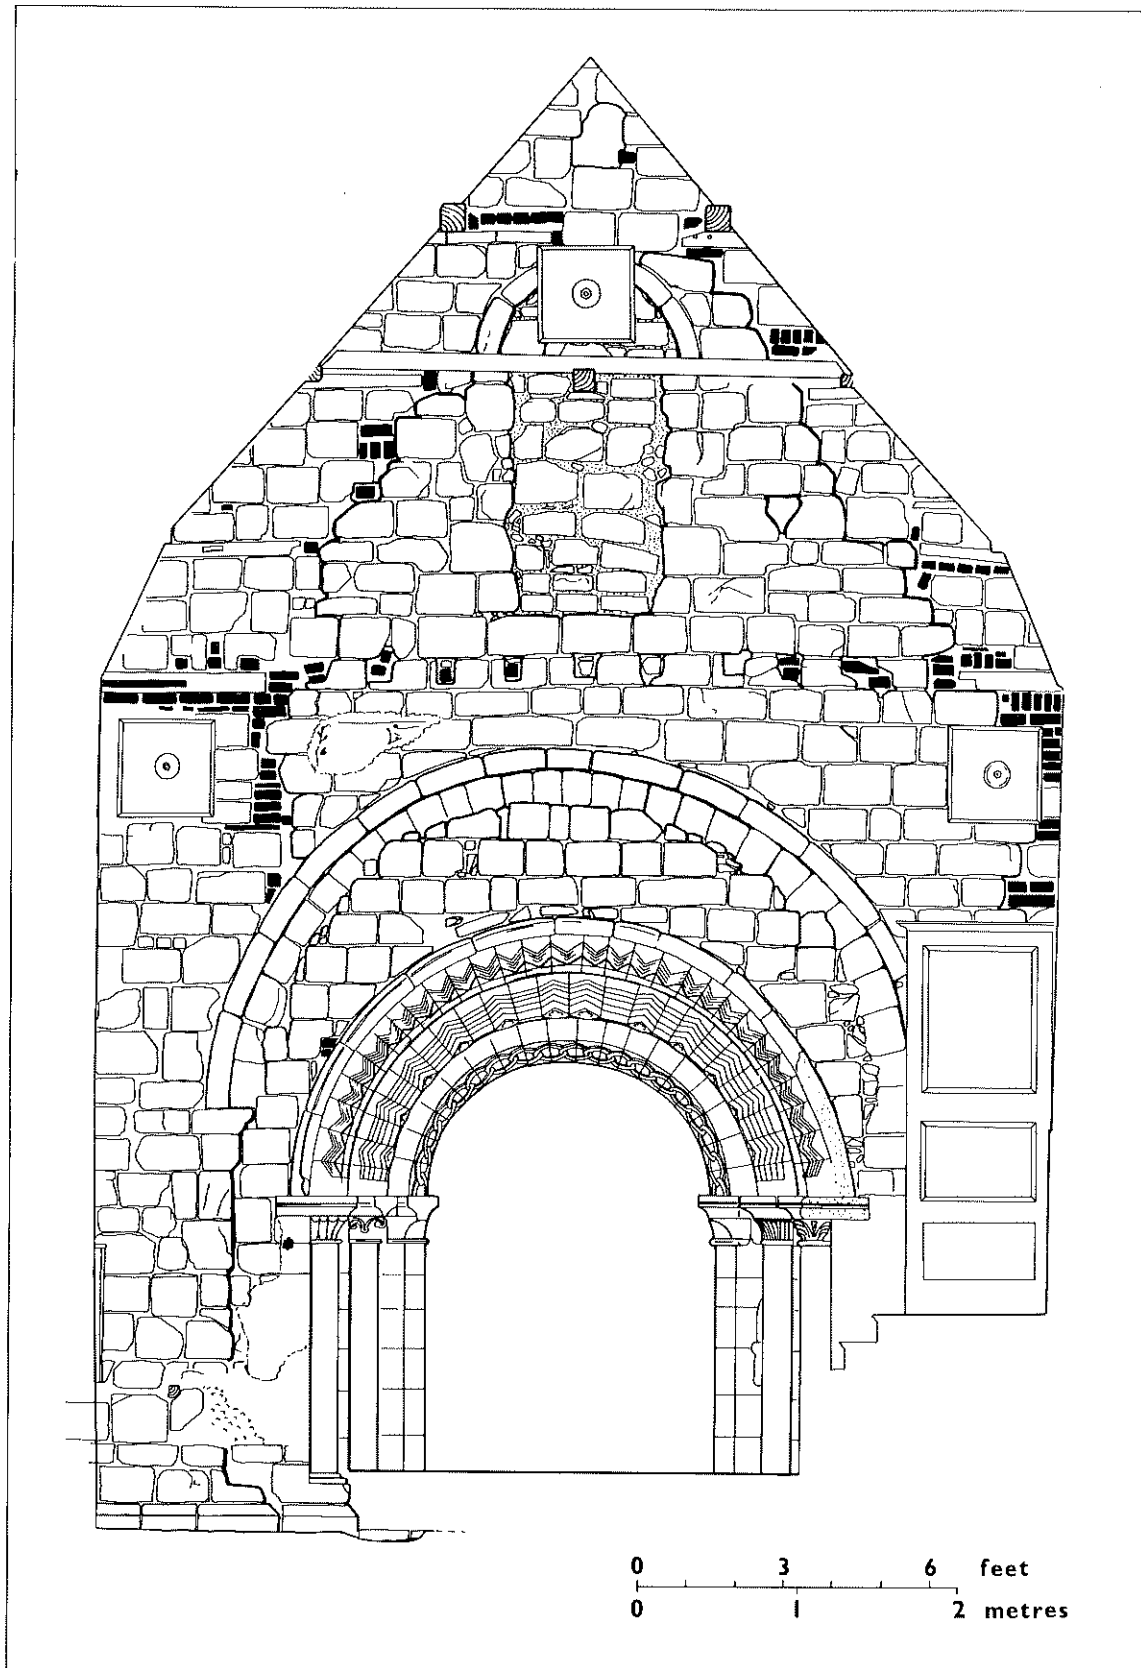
THE WEST ELEVATION OF THE CHANCEL WEST WALL
